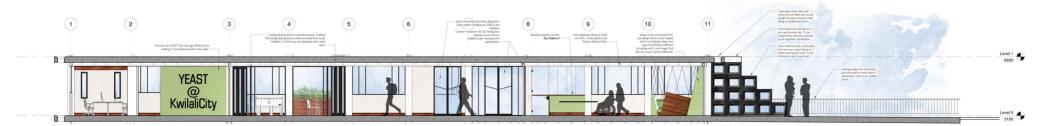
Ground Floor Section B-B (, by Author, not to scale)
